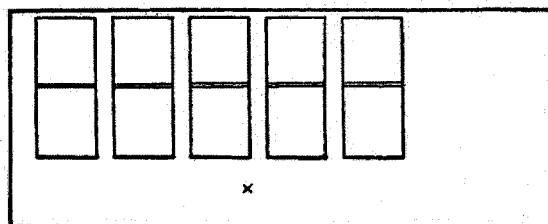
Proper location of windows for conditions named: lower part of the windows, four feet above the floor; distance from floor to ceiling, twelve and one half feet; top of windows, twelve feet above the floor; windows, three and one half feet wide; mullions (supports between windows), one foot wide; distance of rear window from rear wall, eighteen inches; distance from front end of room to first window, nine feet. The cross marks the center of the schoolroom population.
